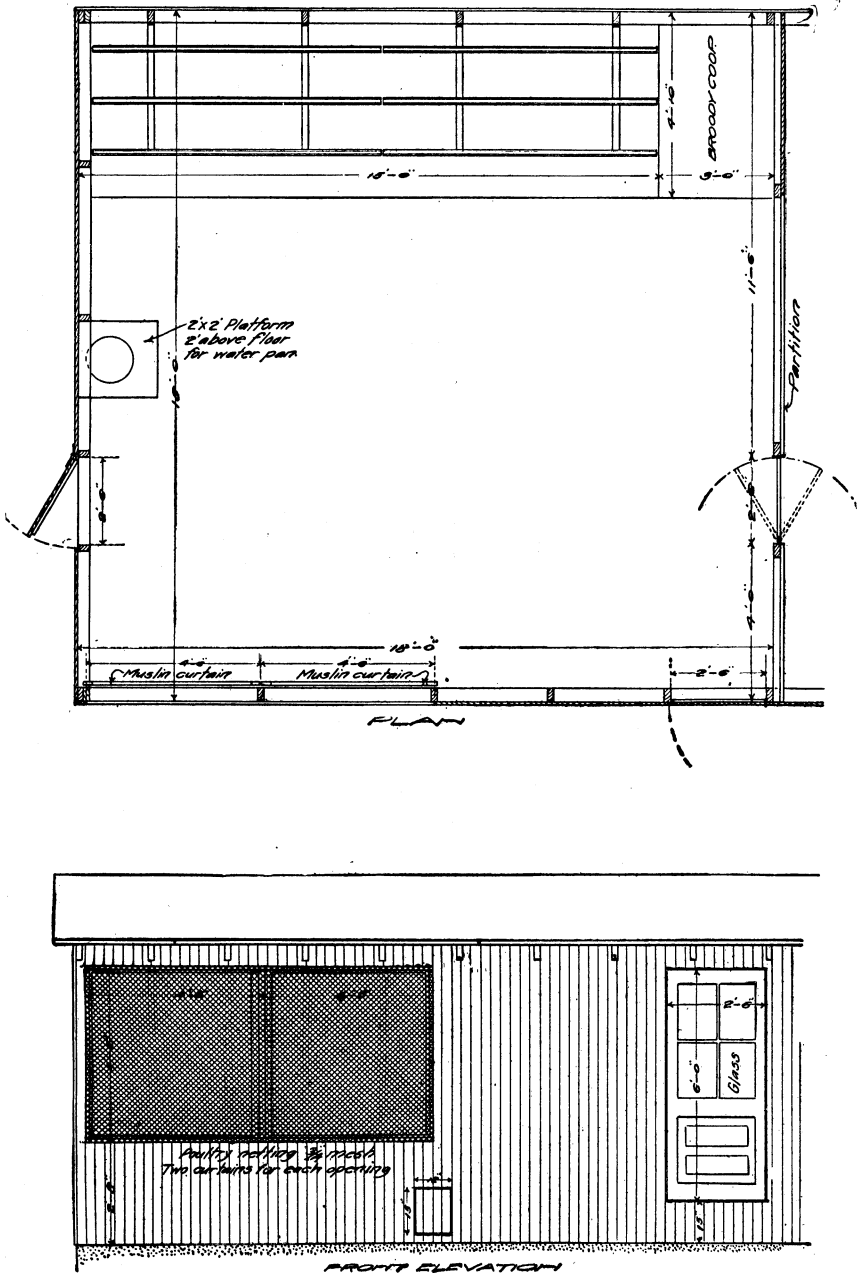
Floor plan and front elevation of laying house used at Government Poultry Farm, Beltsville, Md. Capacity, 500 hens. (See figure 8.)
